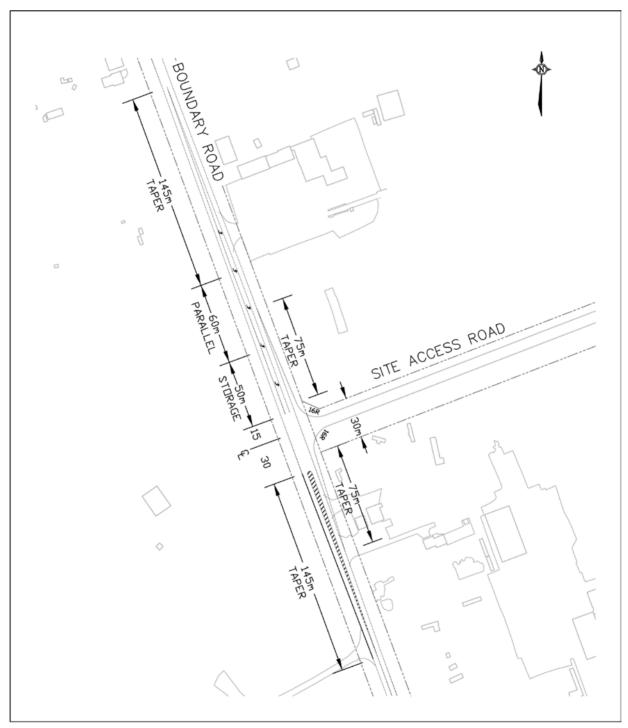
Proposed Boundary Road/Site Access Geometry
